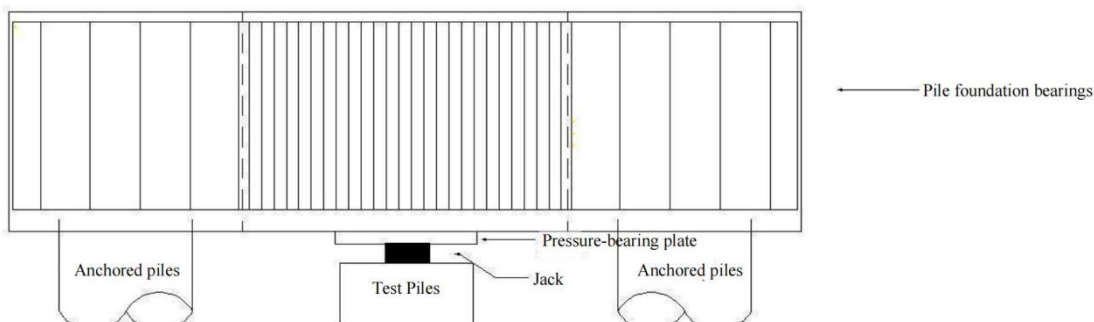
Schematic diagram of the Sz6 anchor pile method of loading
